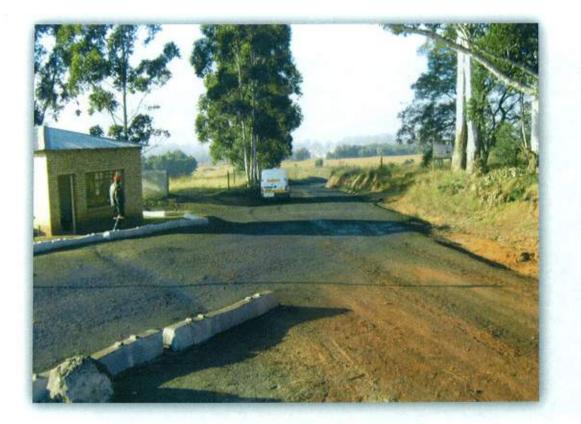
Entrance Road to Railway Siding (Photo 2)
